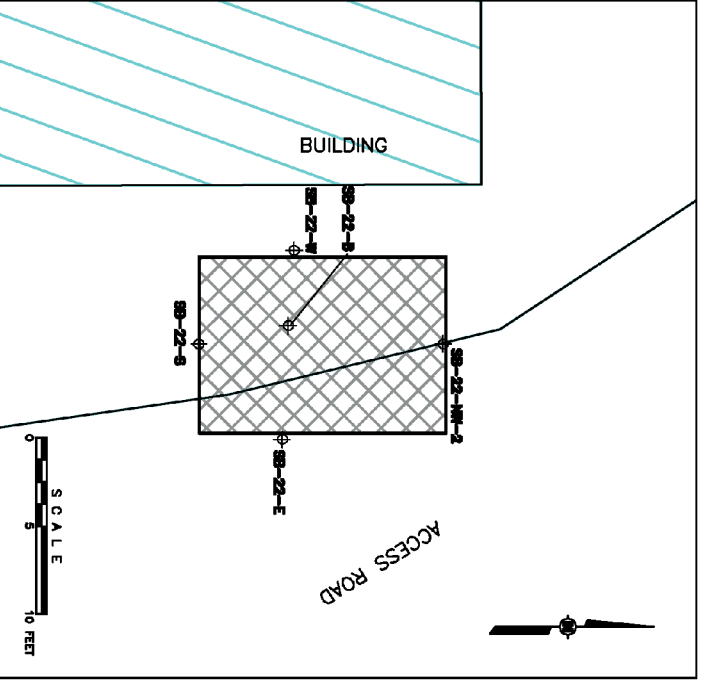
DETAIL A: WEST OF FORMER RESEARCH LAB/QUALITY CONTROL BUILDING EXCAVATION (CSB-16)
